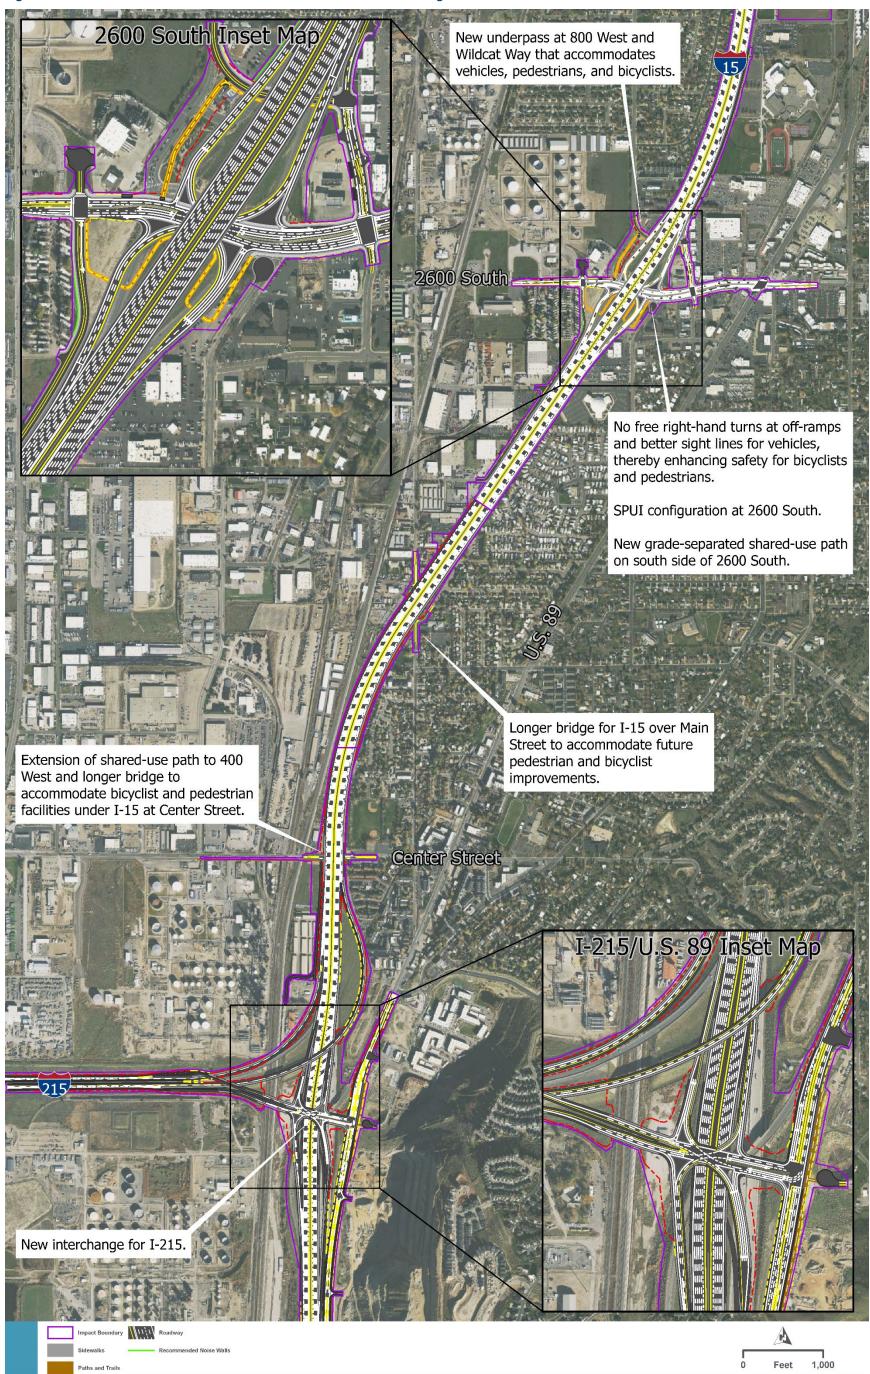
Action Alternative: Center Street North Salt Lake
